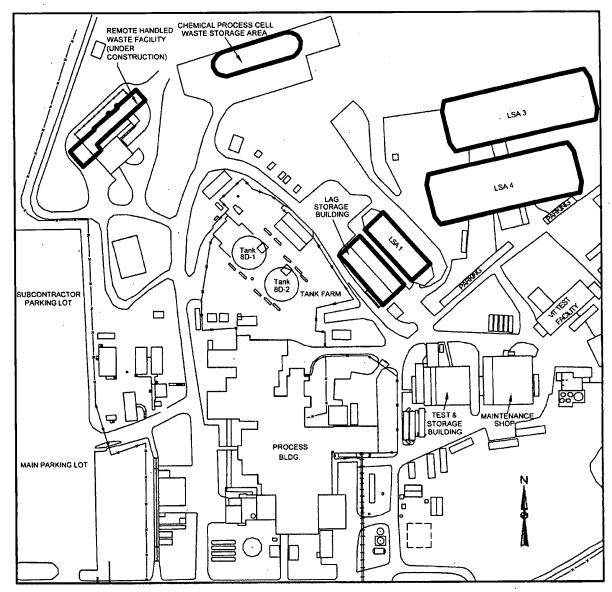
Lag Storage Building, Lag Storage Additions, Chemical Process Cell Waste Storage Area, and Remote Handled Waste Facility
